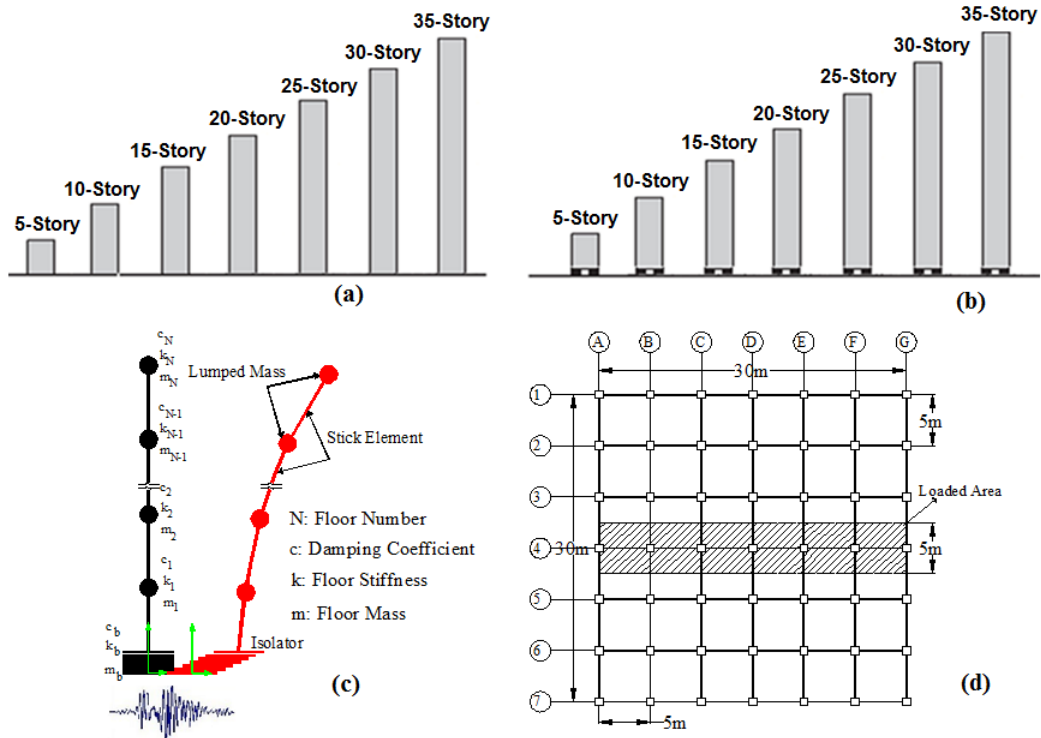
a) Fixed-Base building (FBB); b) Base-isolated building (BIB); c) Lumped-mass stick model; and d) Area plan and selected frame with a loaded area
